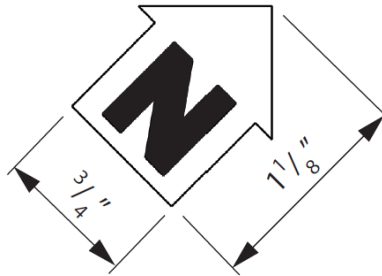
Standard structure detailing cell (North Arrow)
